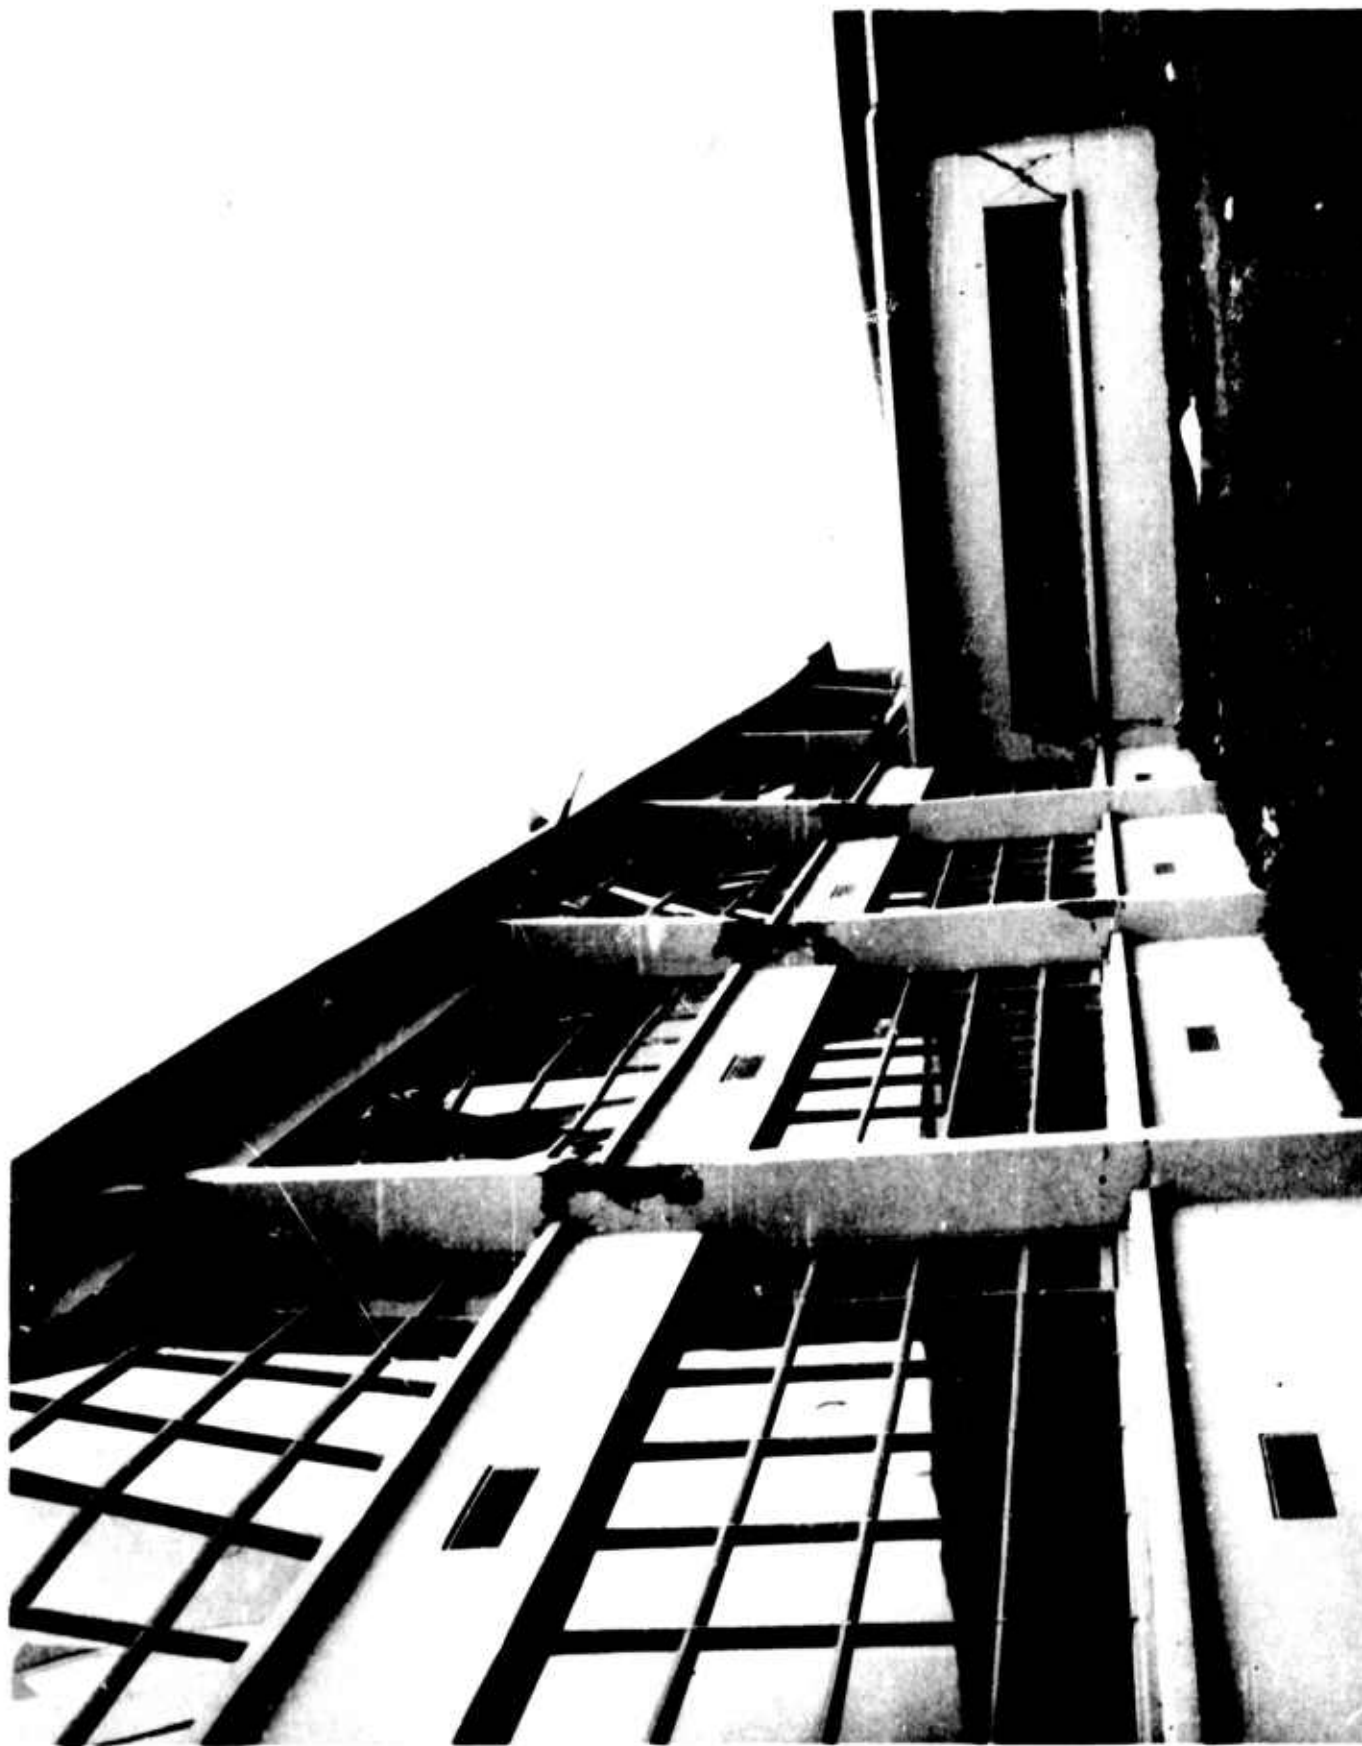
West Anchorage High School (Column damage in east wall of wing A near the library)
